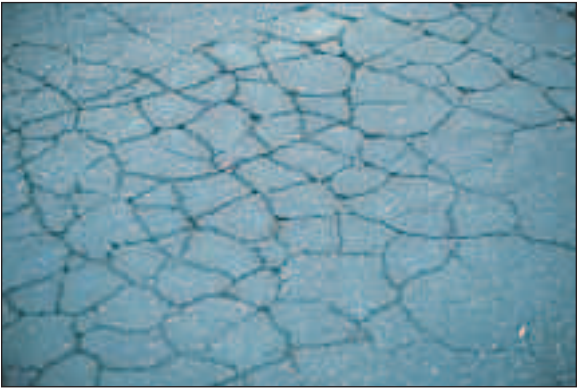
Distress Type ACP 1—Fatigue Cracking
